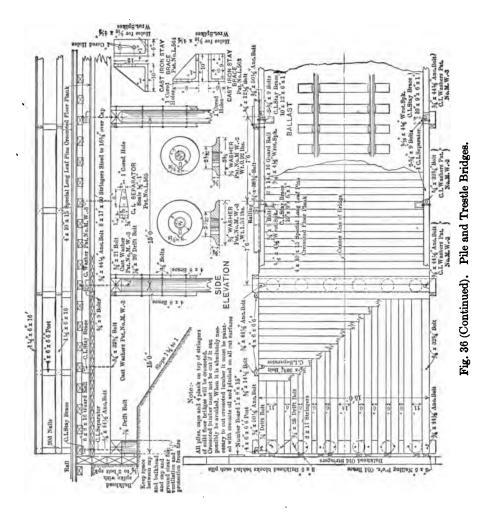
illustrates the ballasted floor for pile and trestle bridges as adopted by the Union Pacific Railroad, with bents 15 ft. centers, six piles or posts to the bent.
